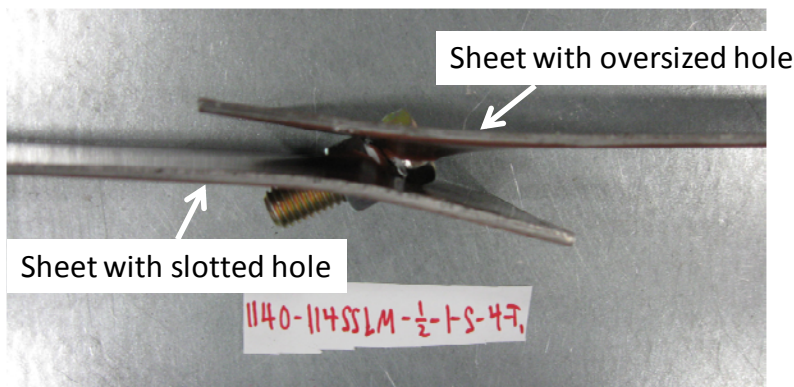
Bearing Failure of Test Specimen 1140-114SSLM-1/2-1-S-4-T1
